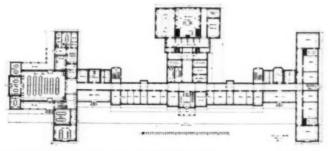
Pavilion for male tuberculosis patients-Floor plan.
